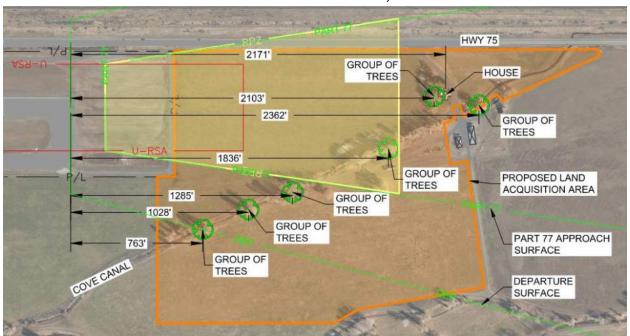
APPROACH AND DEPARTURE SURFACES AT SUN, WITH PROPOSED ACQUISITION
